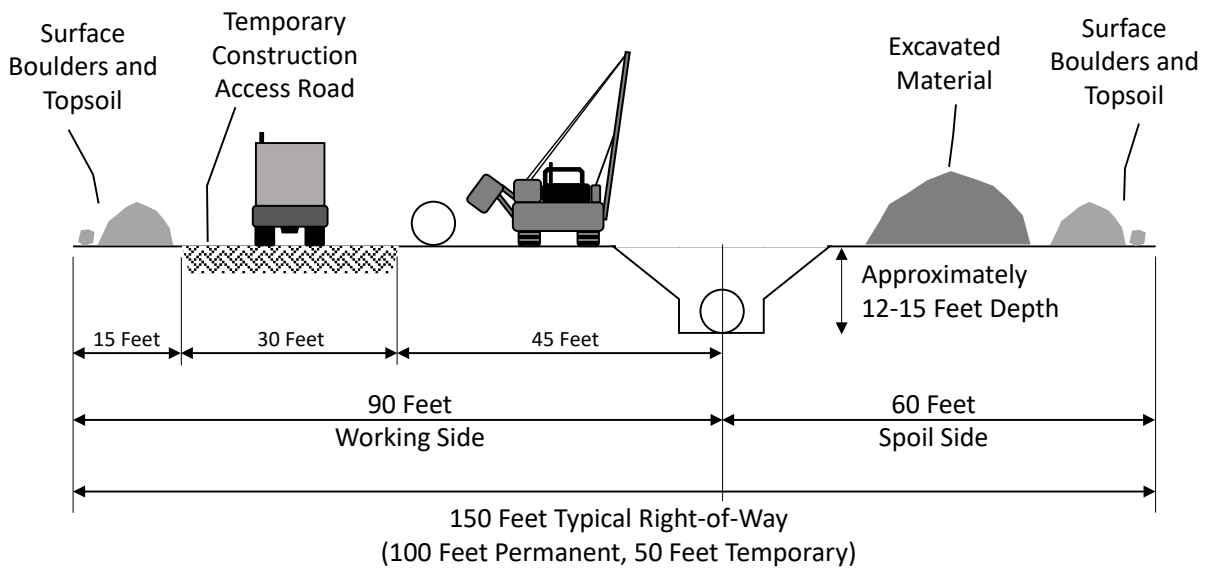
Typical ROW for LPP Pipeline Construction away from Highway
